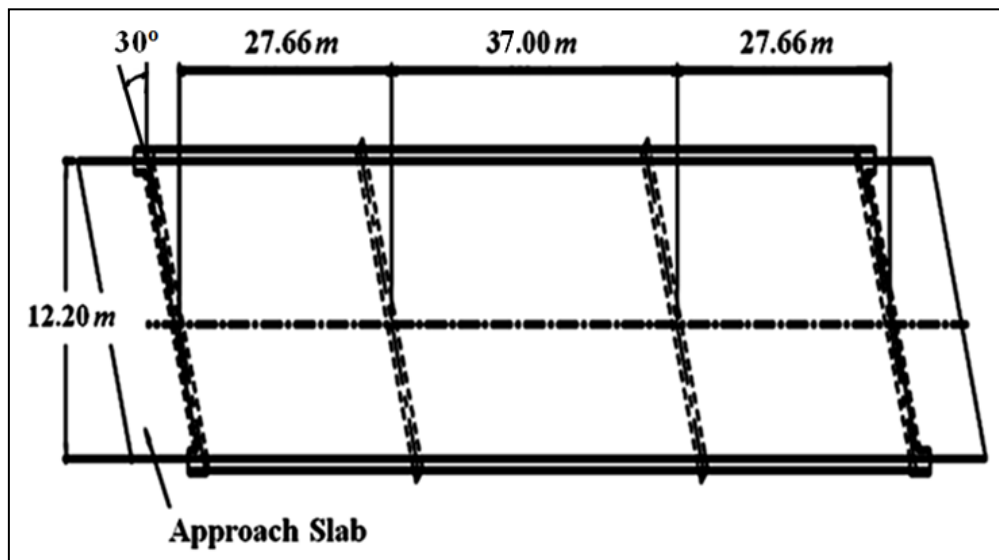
Plan view of Iowa highway 60 bypass [29].
